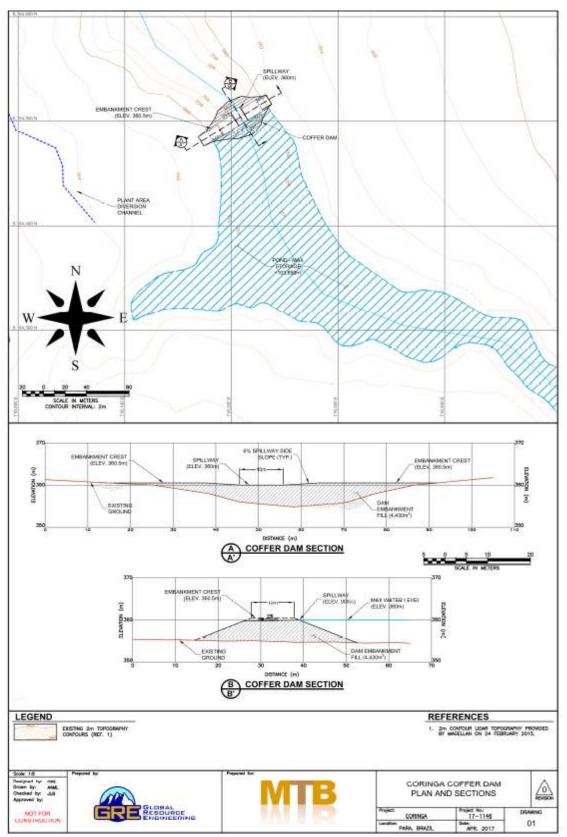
Coffer Dam and Pond - Plan and Sections
